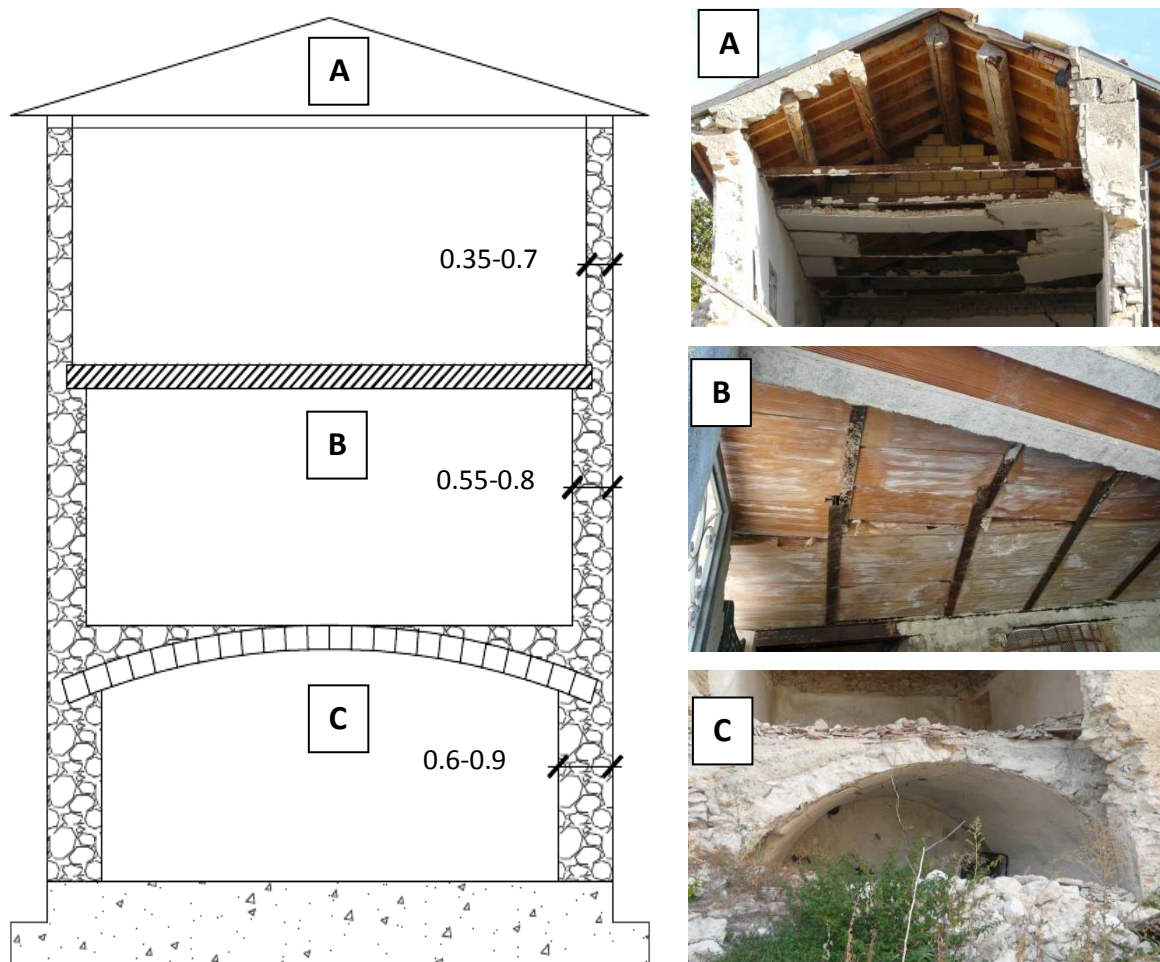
Typical 3 storeys building configuration for rubble stone URM
